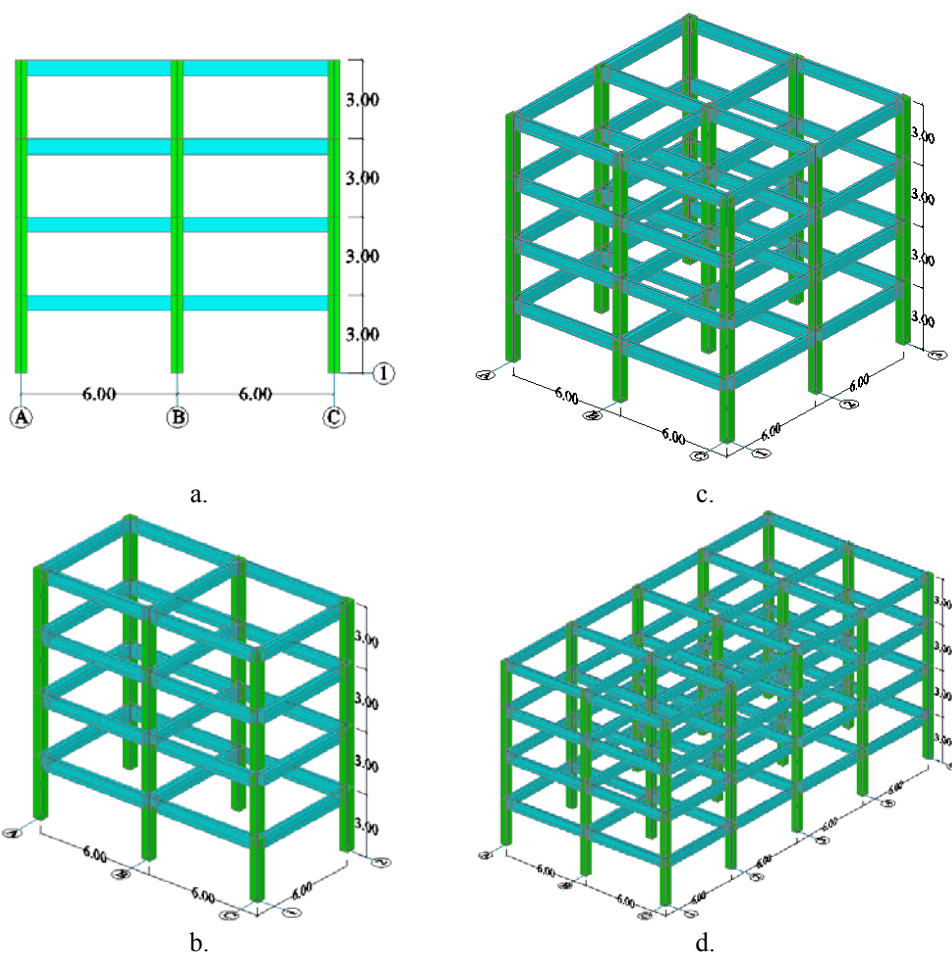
Studied frame structures. (a) Planar frame, (b) Spatial frame with one bay, (c) Spatial frame with two bays, (d) Spatial frame with four bays
